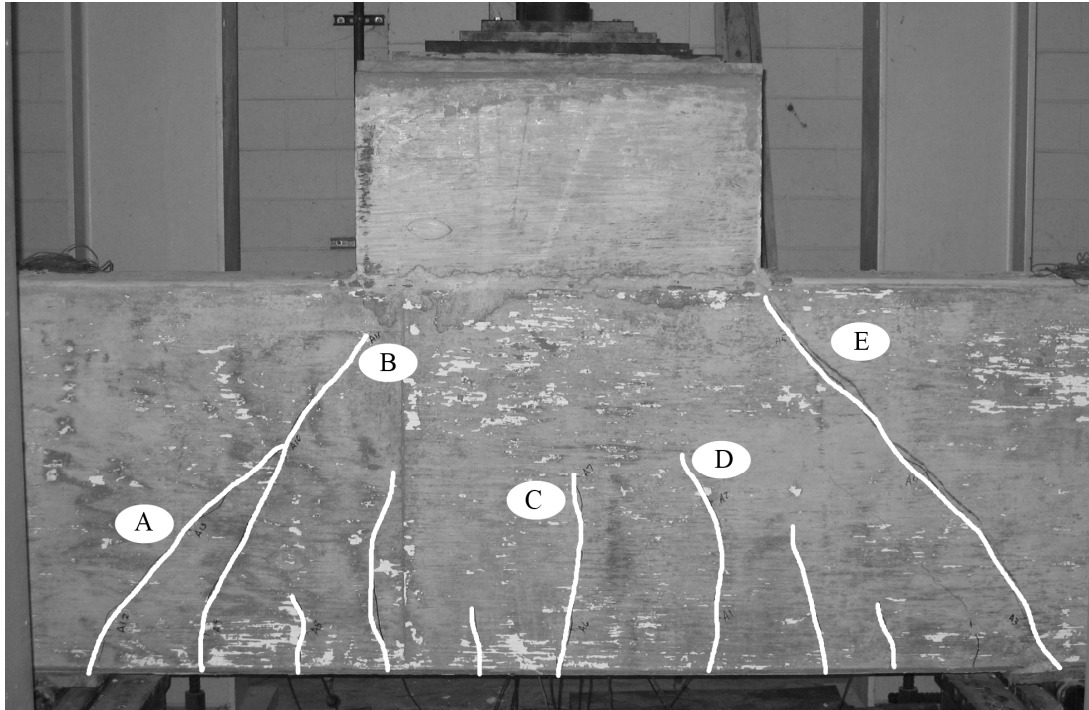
Specimen with 1.3% longitudinal and crack control reinforcement
